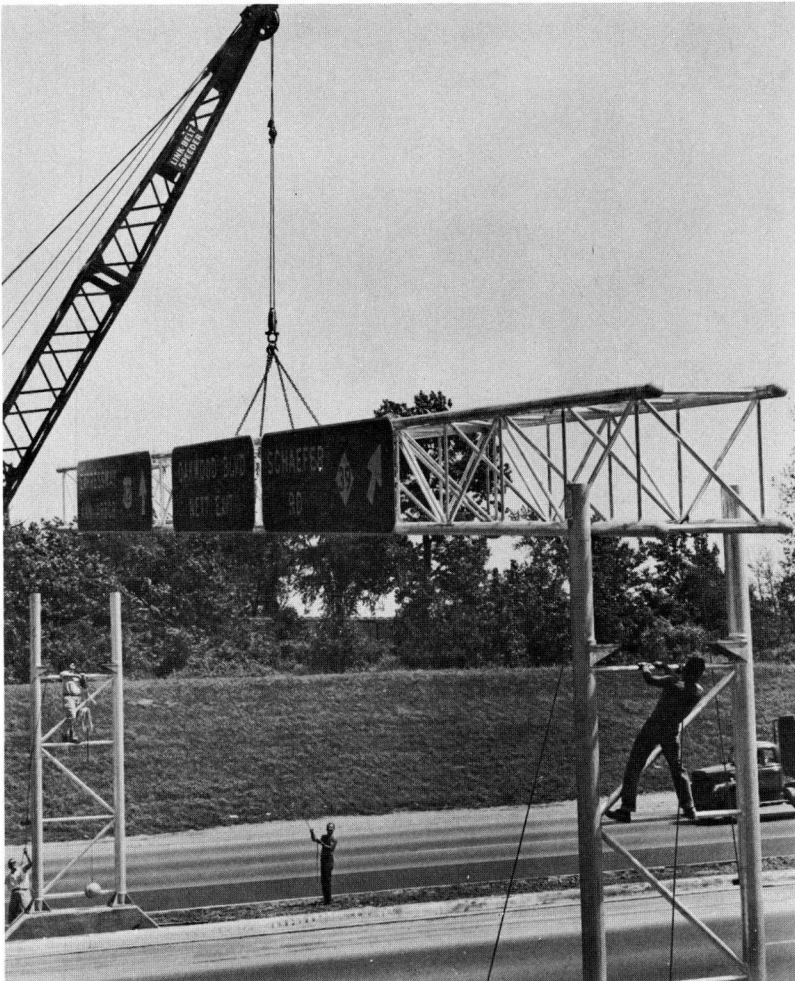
Welded tubular truss supporting overhead highway signs.
